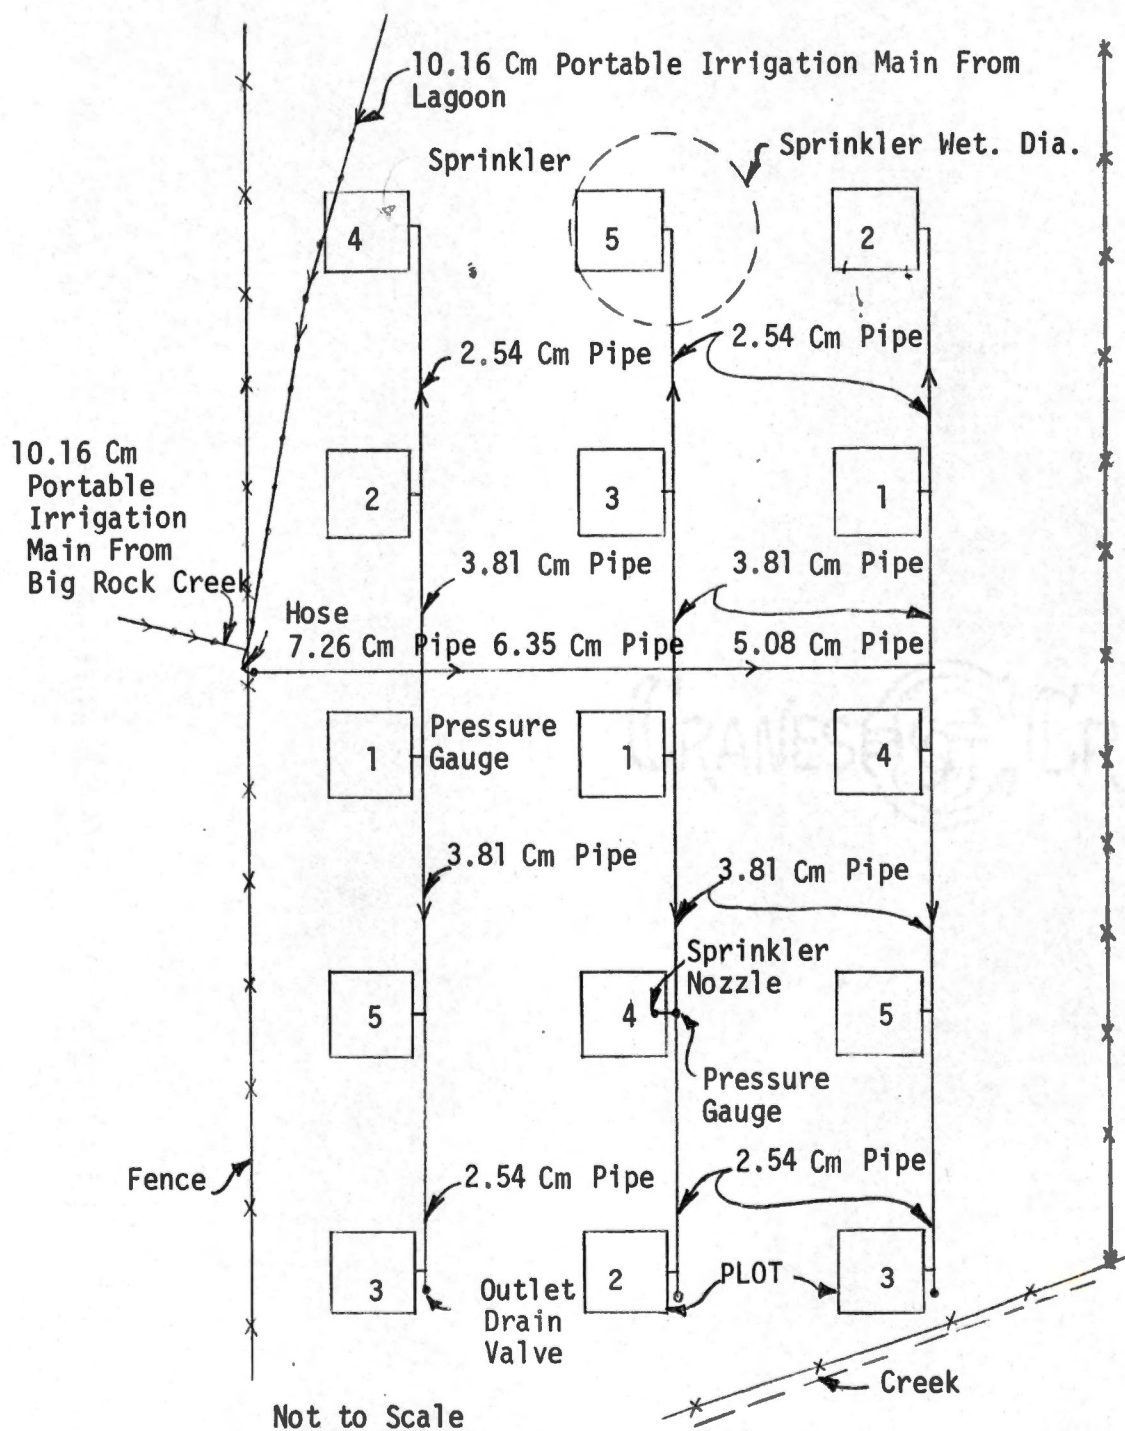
Underground PVC Pipe Irrigation System used in 1979.
